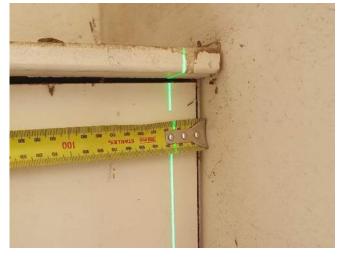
Bowing of Wall at NW Corner of Western Wing
